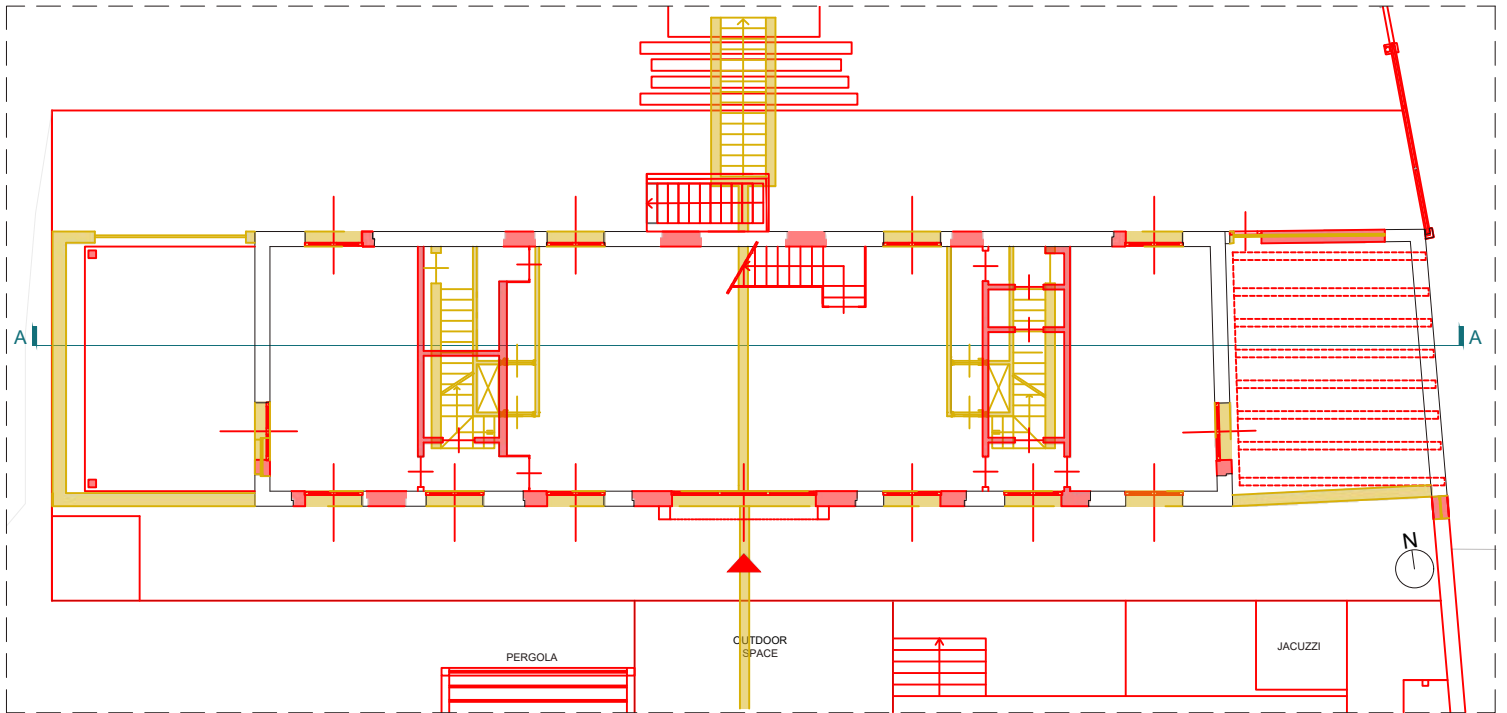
Demolition/reconstruction GROUND FLOOR PLAN
